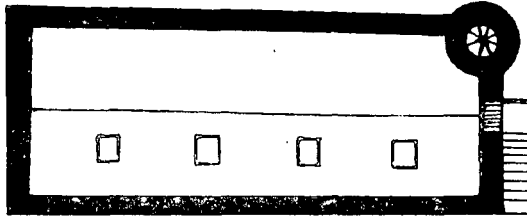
Ground Plan of "The King's Cellar," showing ridge of roof, rooflights, original stairs, etc.
